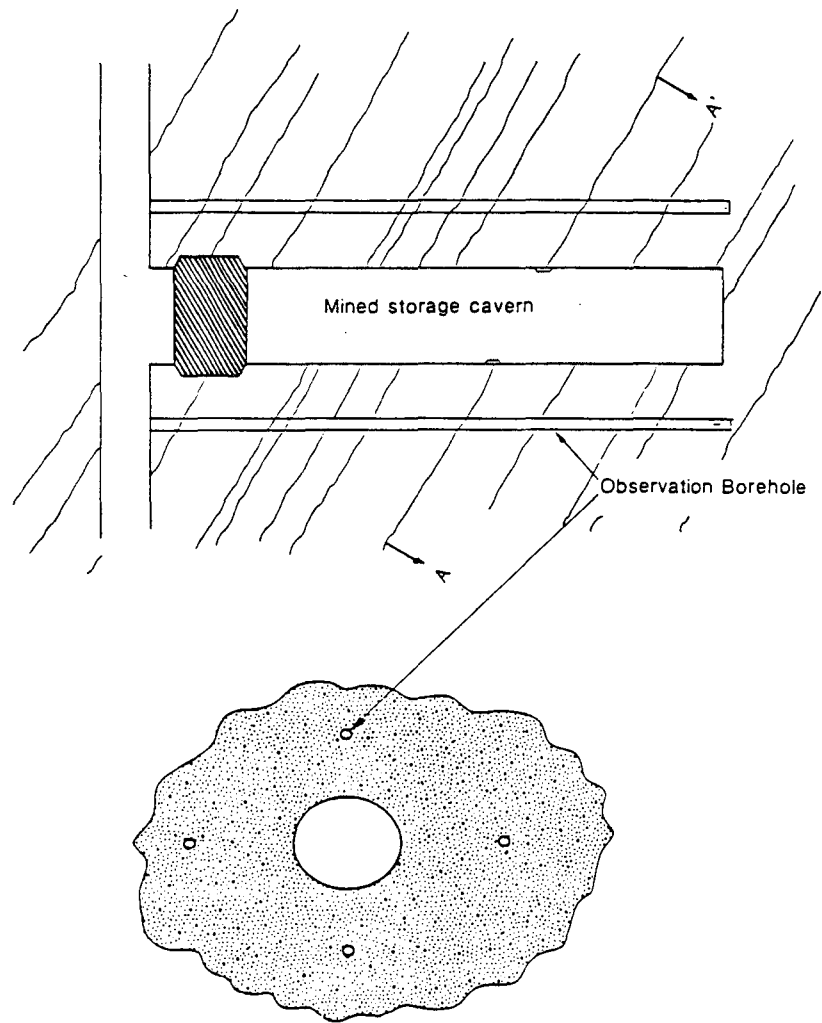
Use of foam to seal fractures intersecting a mined cavern.
